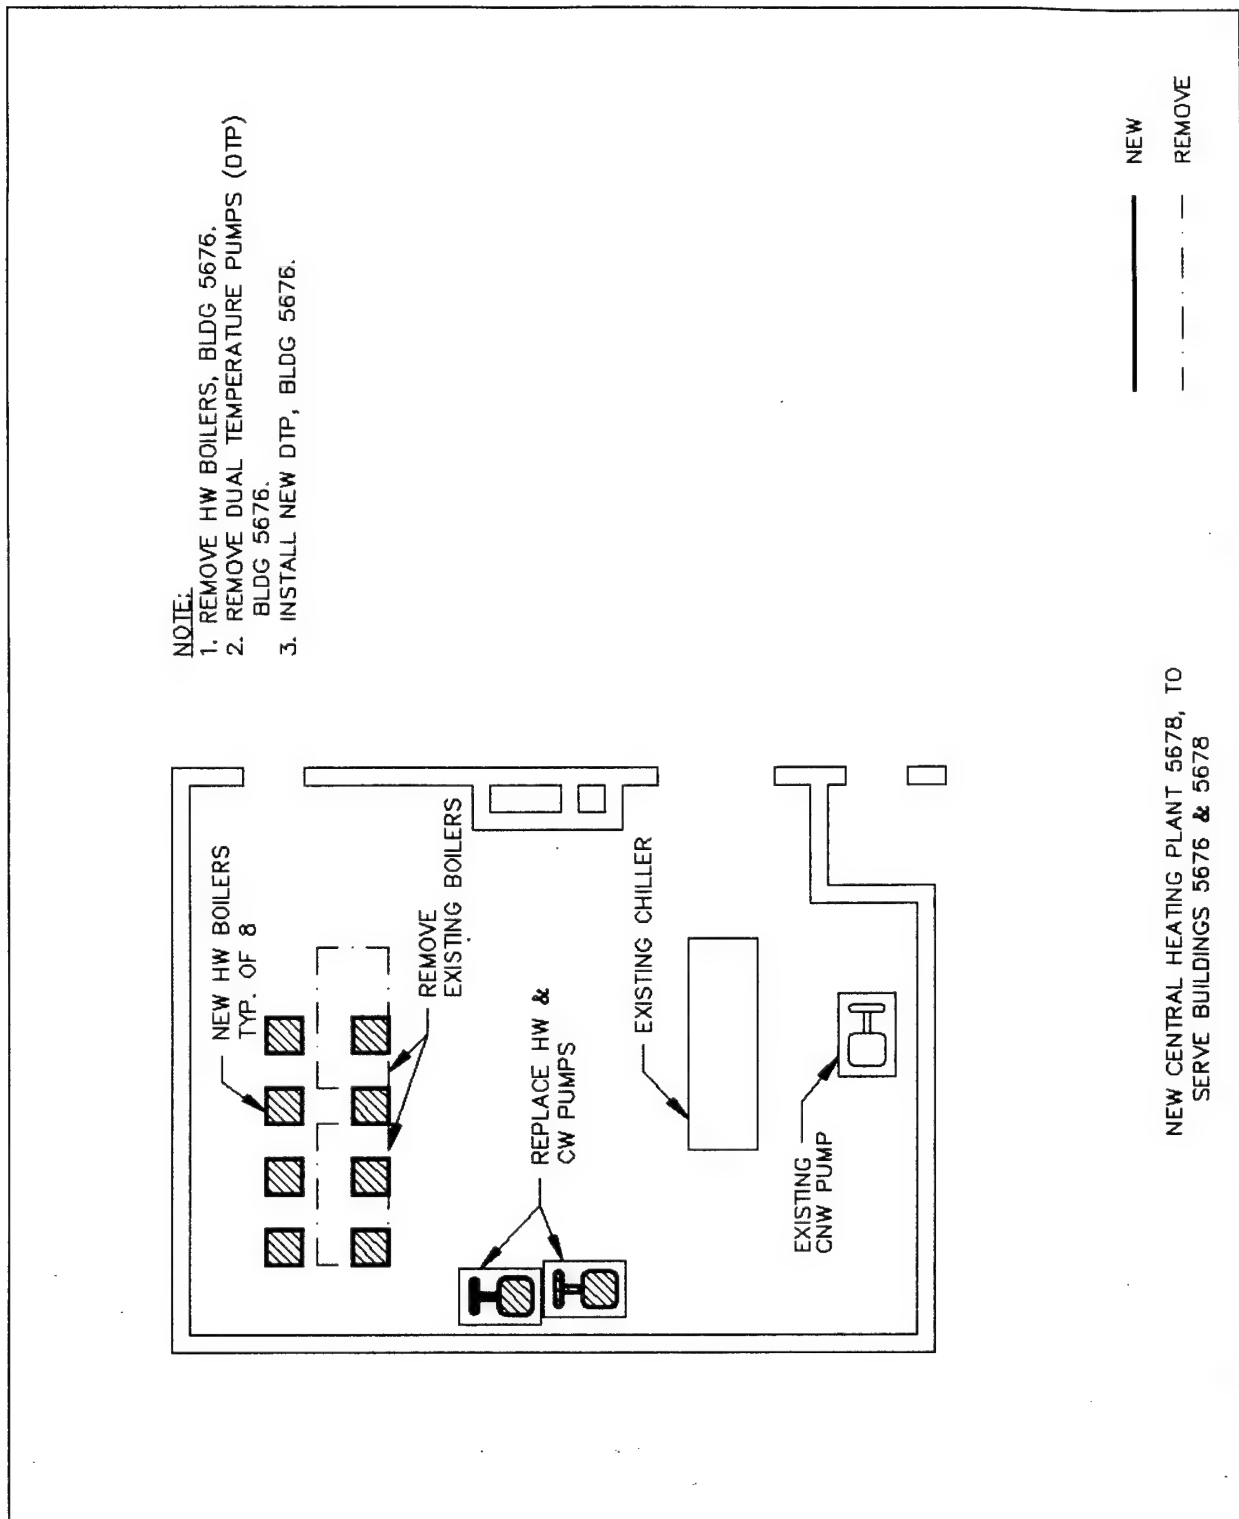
MECHANICAL ROOM LAYOUT, CENTRAL PLANT 5678
